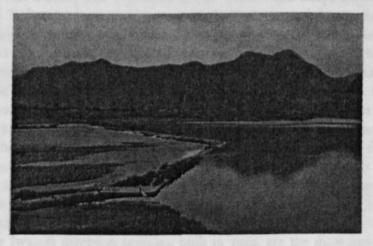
Ground view of diversion dam. Note spillway in concrete section in foreground and loosely constructed central section.
